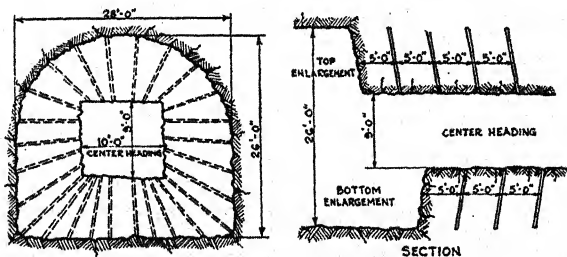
Large railway tunnel driven by center heading and ring drilling method
